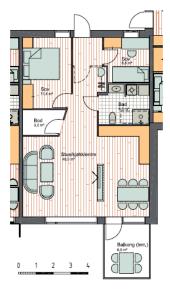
Typical apartment floor plan [ByBo AS 2009]
